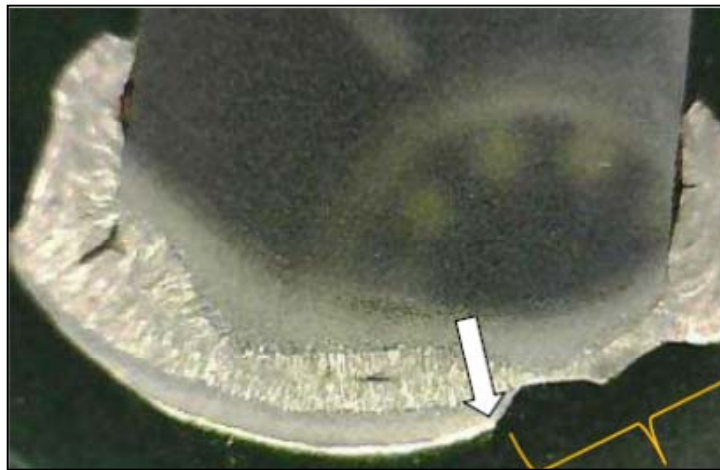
Photo. Cross section of shear stud weld showing change in crack morphology.
